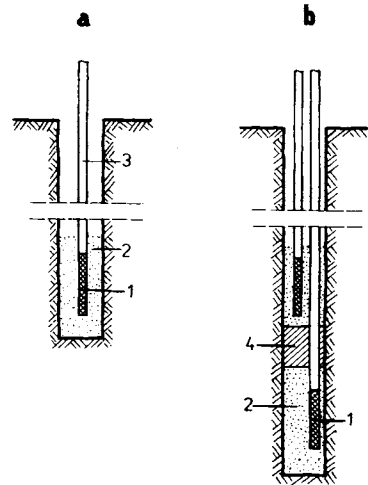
Single- and double-tube piezometers. a — single tube, b — double tube; 1 — perforated section of tube, 2 — sand, 3 — tube (\varnothing 20 to 30 mm), 4 — seal horizon (clay stopper).
